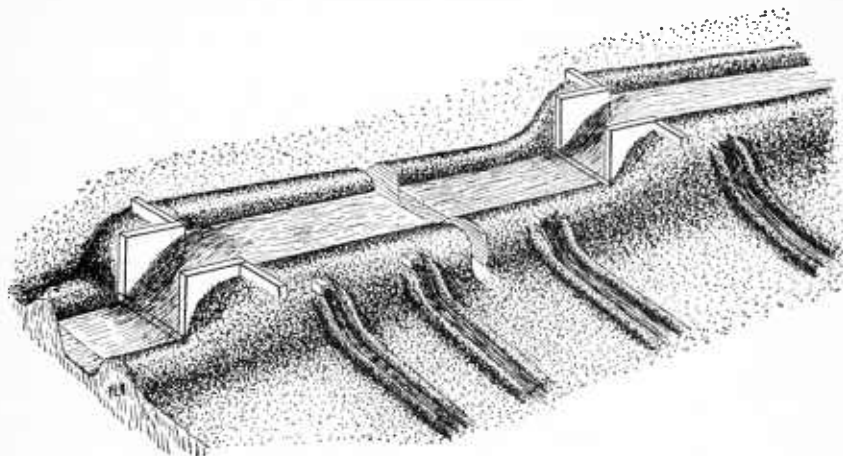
Manner of placing tubes in ditch bank for furrow irrigation.
